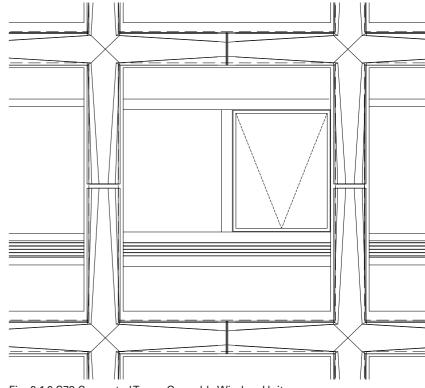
S73 Consented Tower Openable Window Unit
